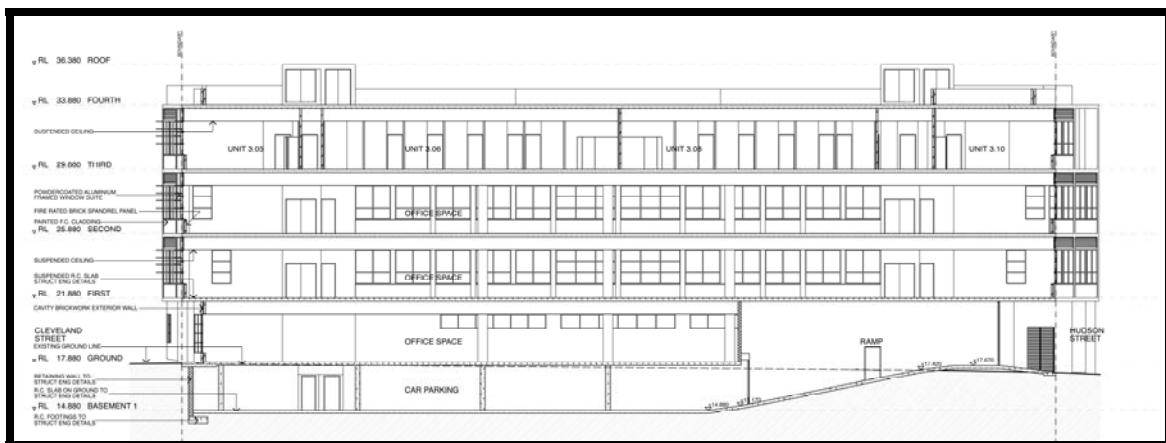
Section 1 of proposed development (not to scale). (Source: Fortey + Grant Architecture, 2010)
